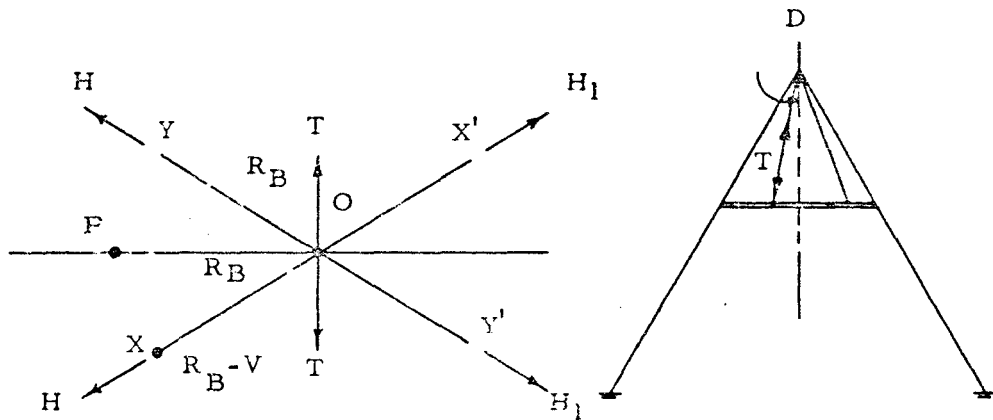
"A" FRAME BRIDGE, PLAN VIEW
